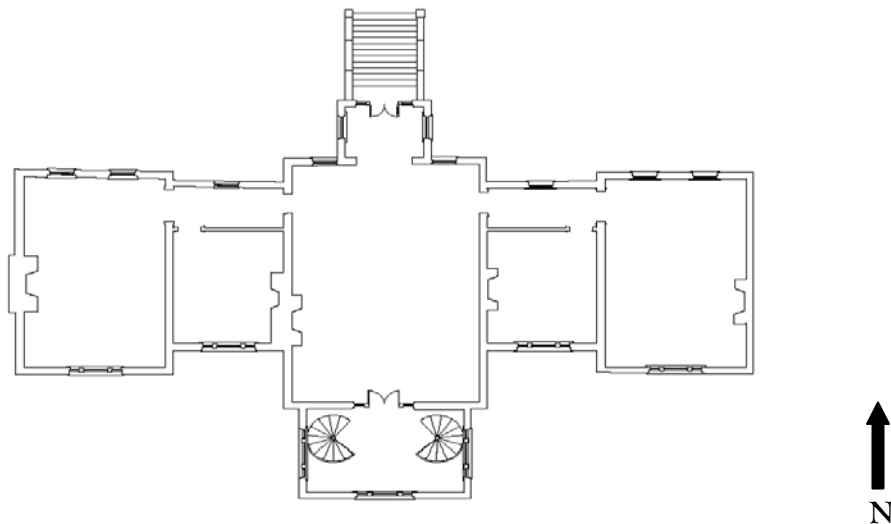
Holt House-Main Floor Plan (1889)⁴
